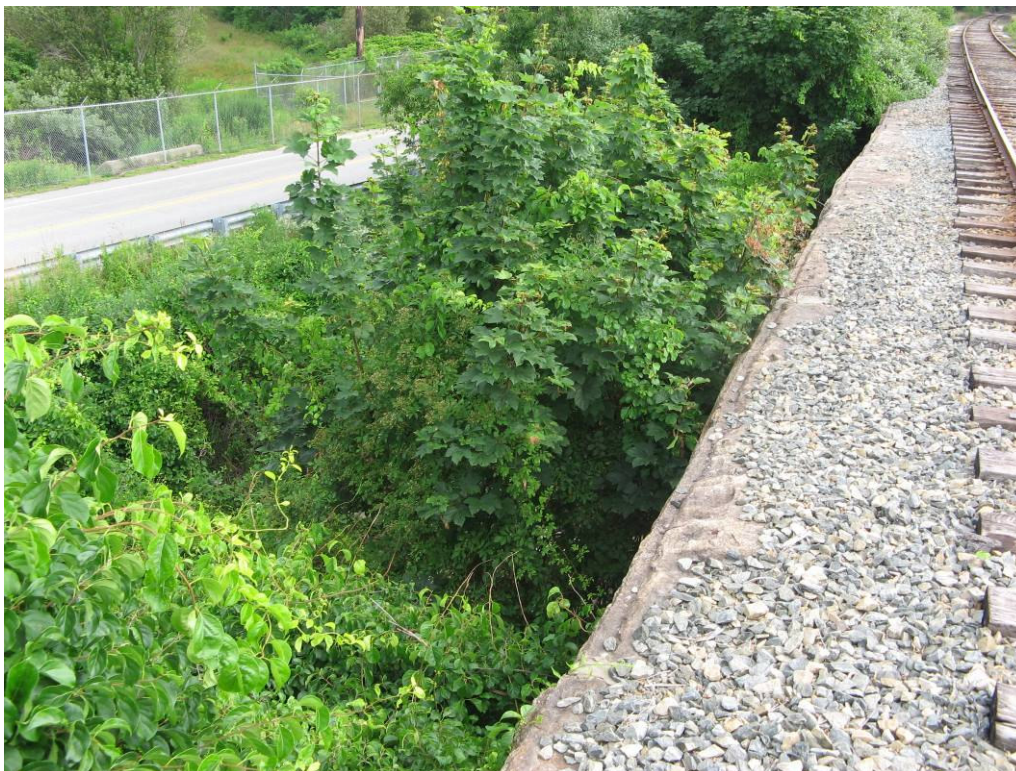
DRAINAGE SWALE AT GOMES BROOK
